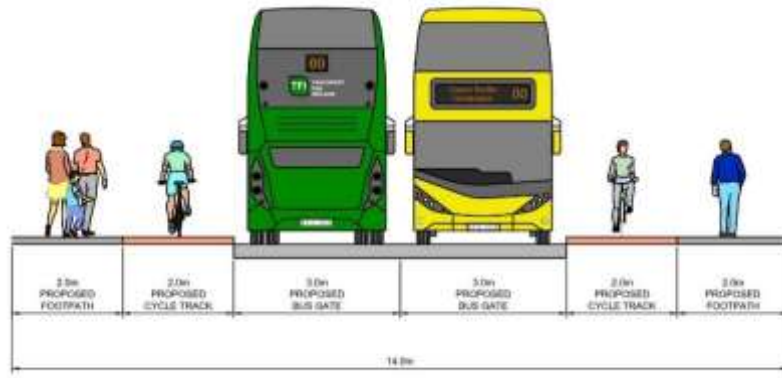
Typical Traffic Management Cross Section (B – B)
